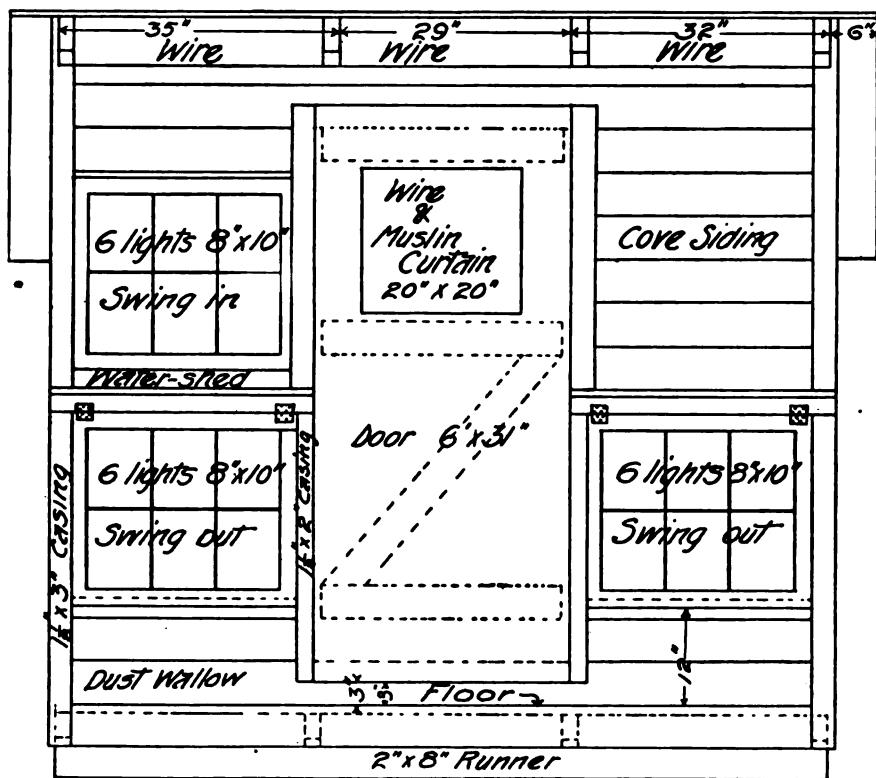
Front elevation of the Cornell breed-testing house. Note the size and location of ventilators in door and in peak between rafters. The rafters are spaced unevenly in order to assist in the interior construction
